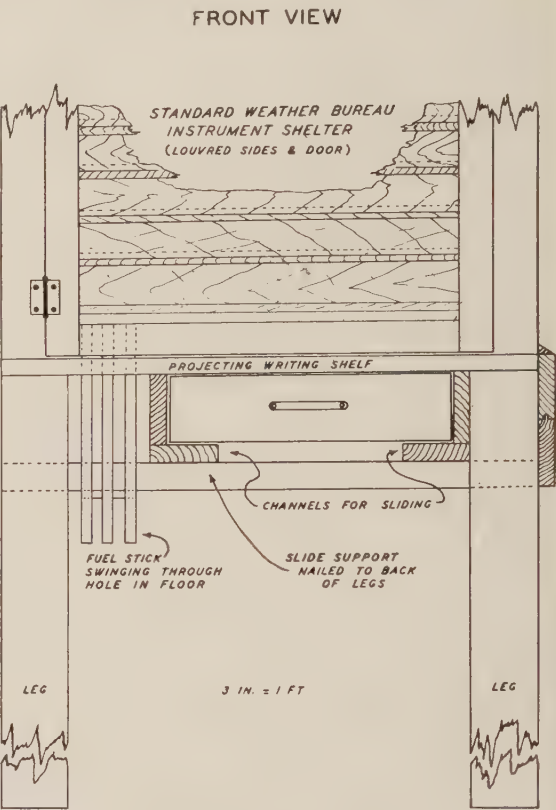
Construction details of a sliding drawer for instrument shelters.
